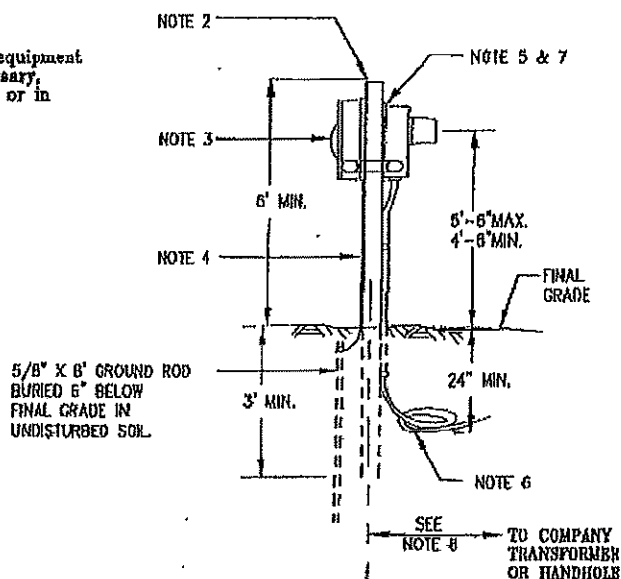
TEMPORARY SERVICE FROM UNDERGROUND FACILITIES
